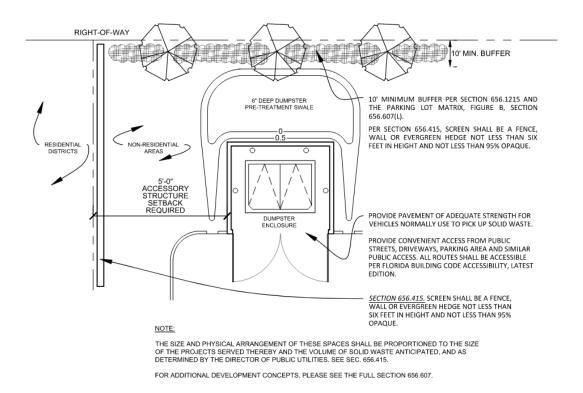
Design Standards for Solid Waste Loading Facility (not to scale)
